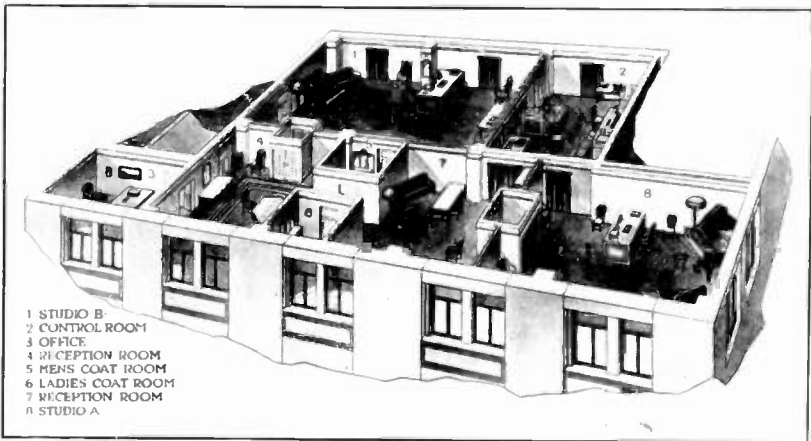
Arrangement of Rooms on the Sixth Floor, Aeolian Building
